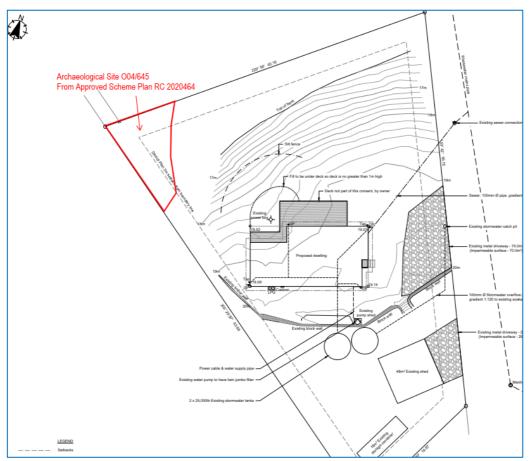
Site Plan with Archaeological Site O04/645 (from RC 2020464) Overlaid.
